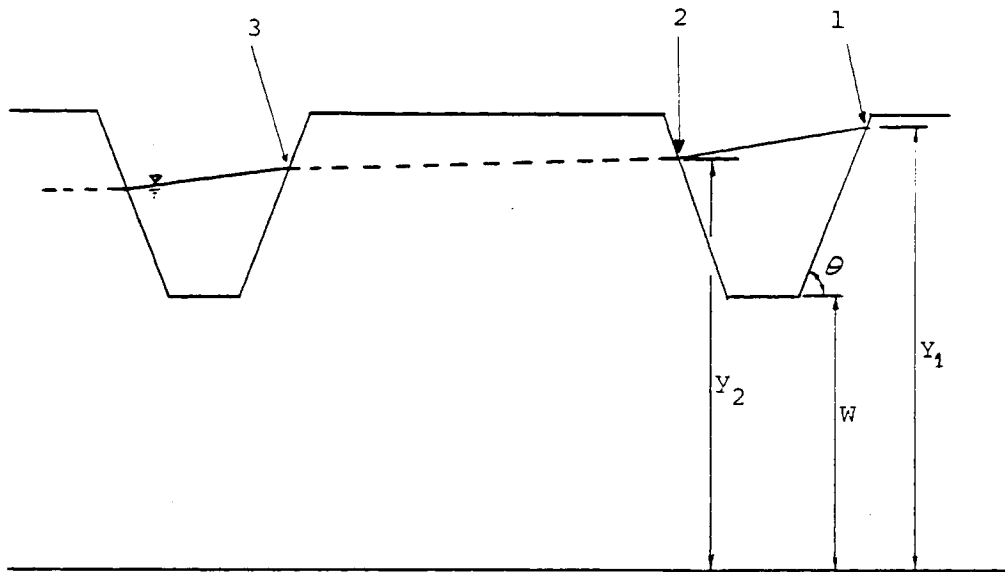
Schematic Water Surface Profile of the Canal Side Weir System.
